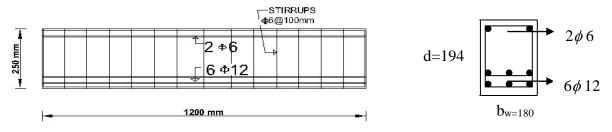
Hybrid Beam Profile and Loading Arrangement.
